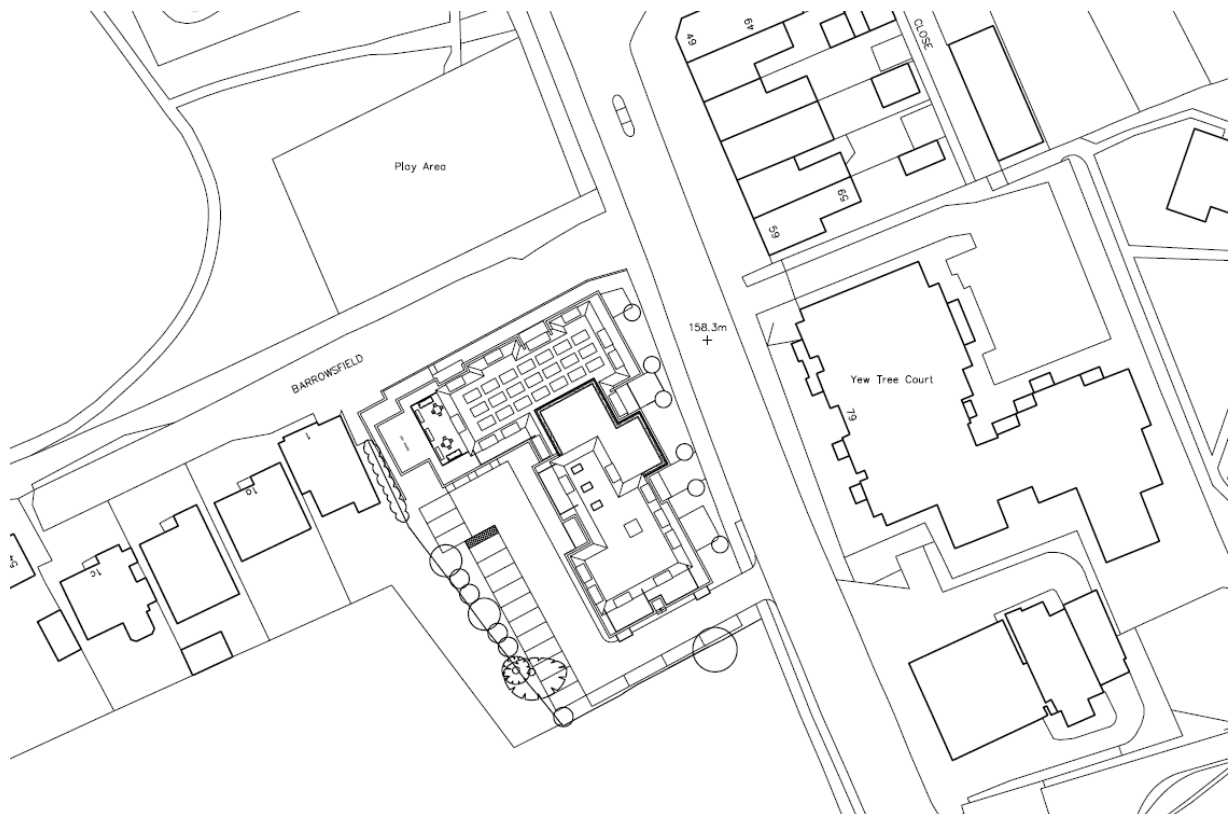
Site plan highlighting the relationship with the adjoining occupiers.
